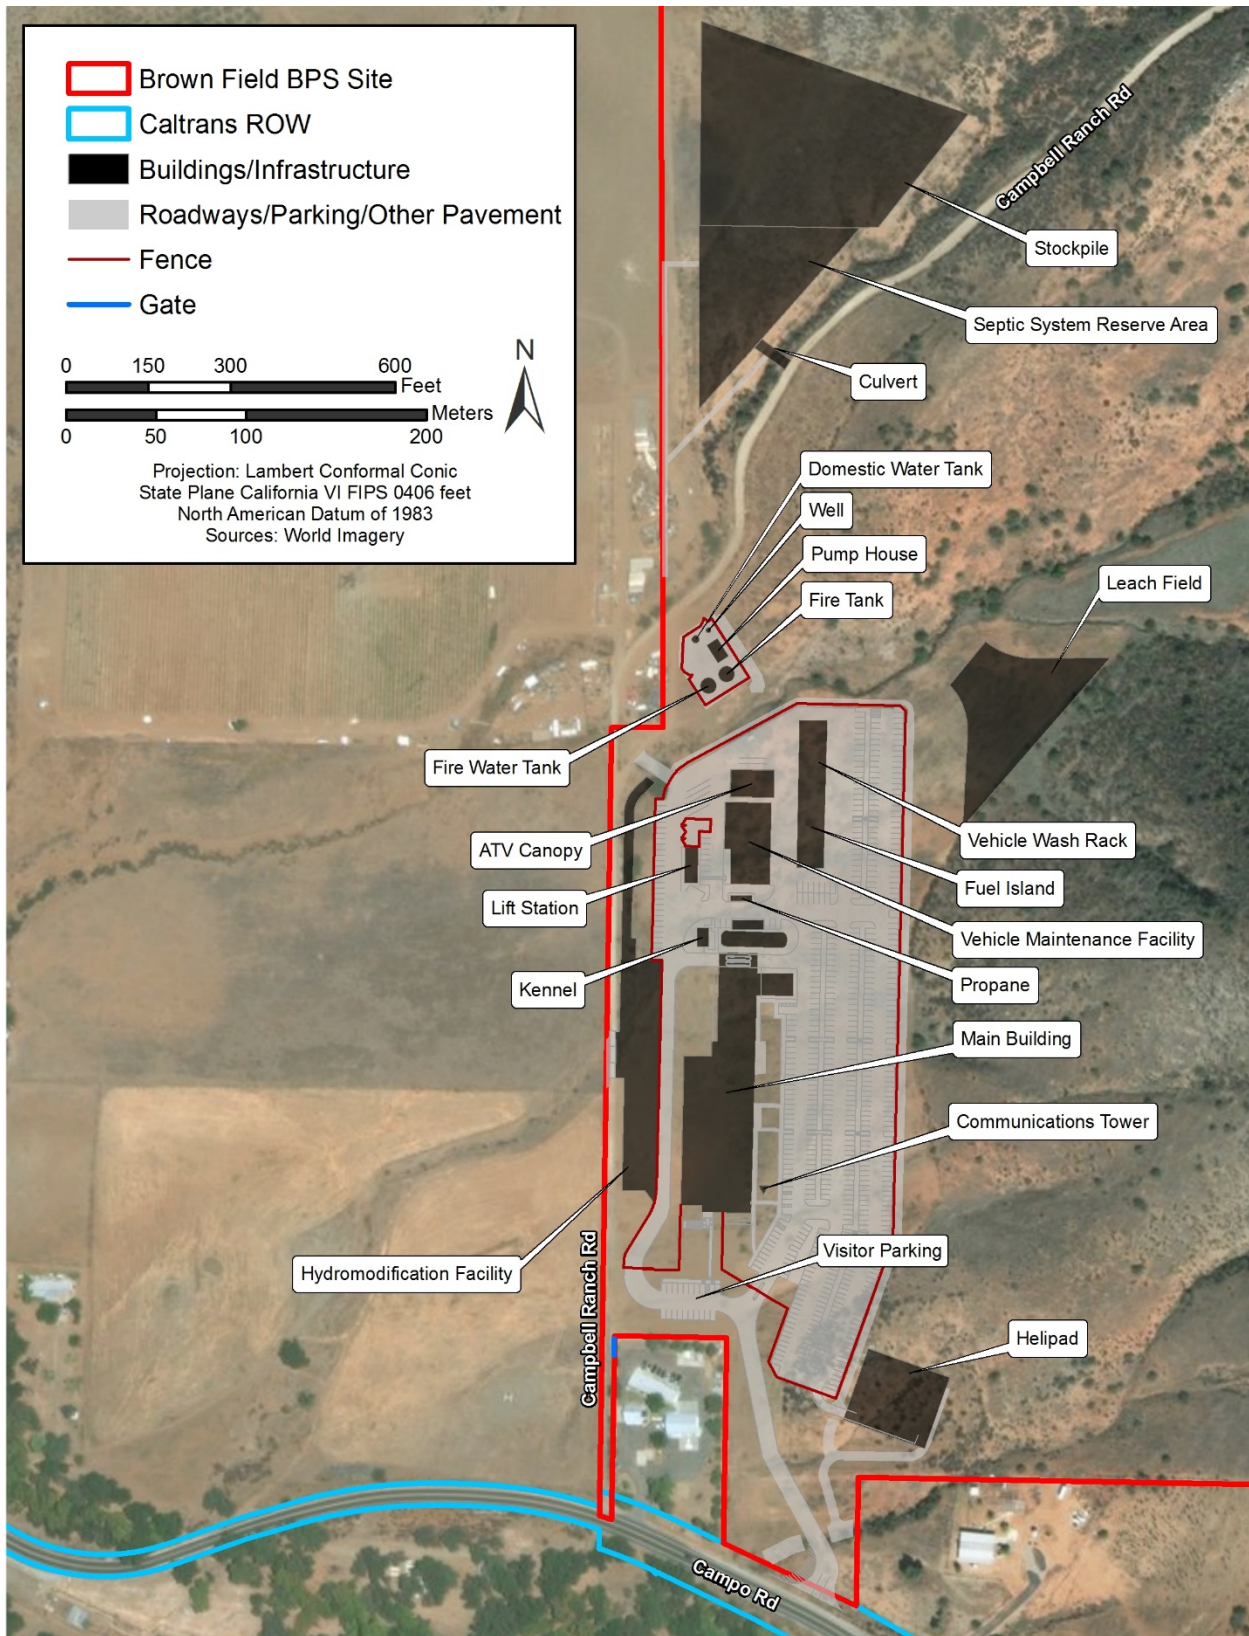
Conceptual Layout of the Proposed Brown Field BPS
